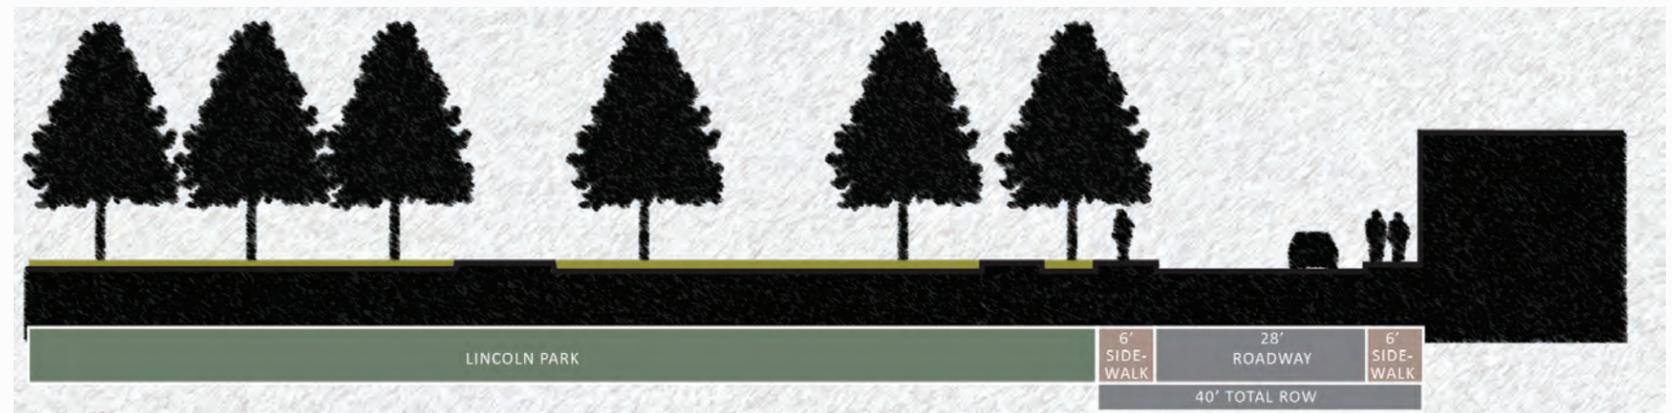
Illustrative Sketch of Section C-C' cutting Lincoln Park as it was before 1966
